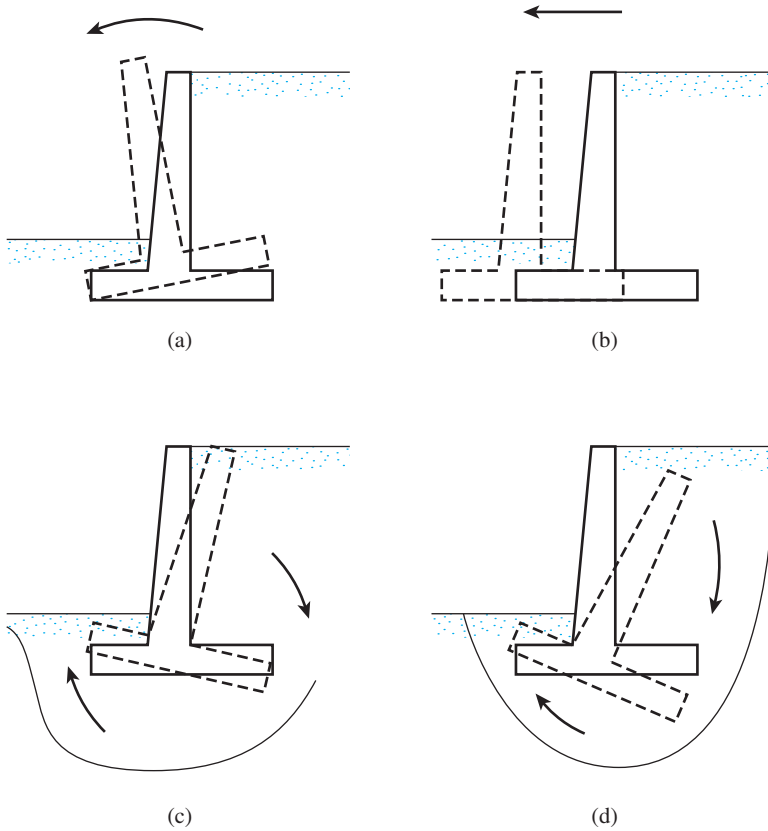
Failure of retaining wall: (a) by overturning; (b) by sliding; (c) by bearing capacity failure; (d) by deep-seated shear failure
